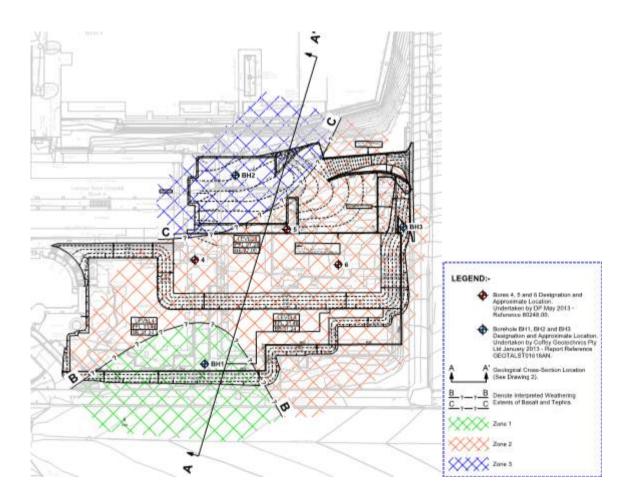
Geotechnical Test Locations Plan, Douglas Partners, 11 July 2013
